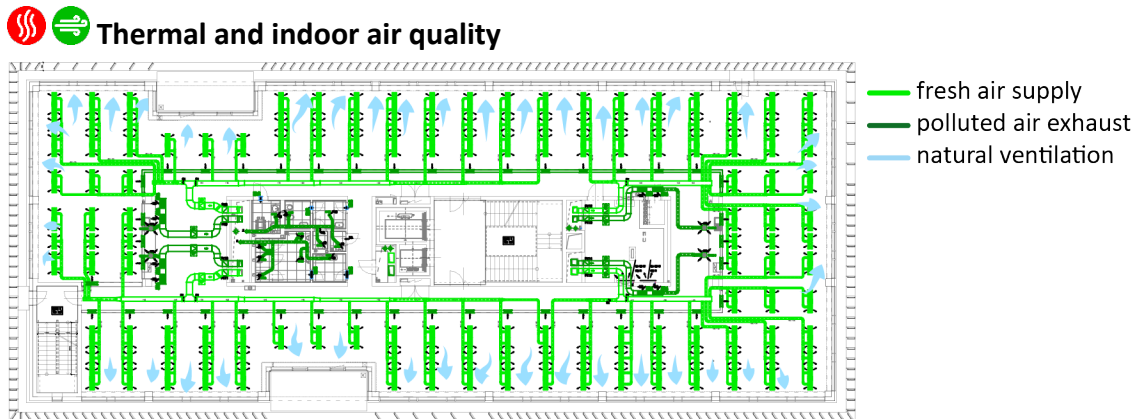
Office Building Konplan - ventilation schema in 2<sup>nd</sup> floor offices (1:500) (adapted from project documentation, original drawing Vladimír Černý)
